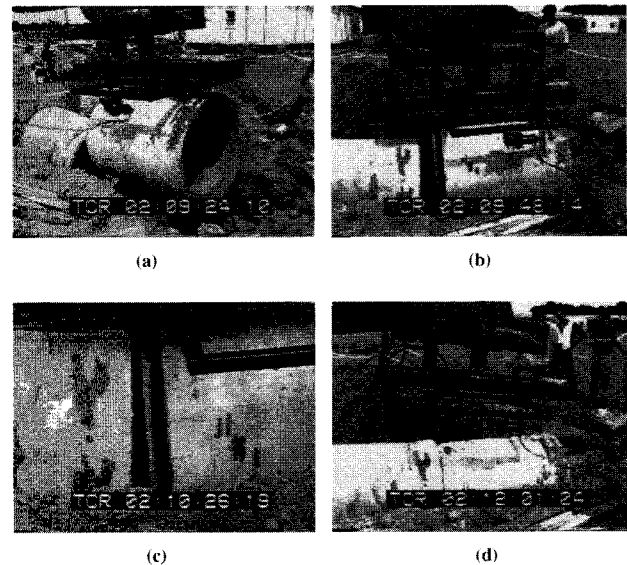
Sequence of Remotely Controlled Pipe-Laying Process: (a) Pipe Being Lowered into Trench; (b) Horizontal Alignment; (c) Final Alignment and Pipe Jointing; (d) Pipe Installation and Remote Release Completed
